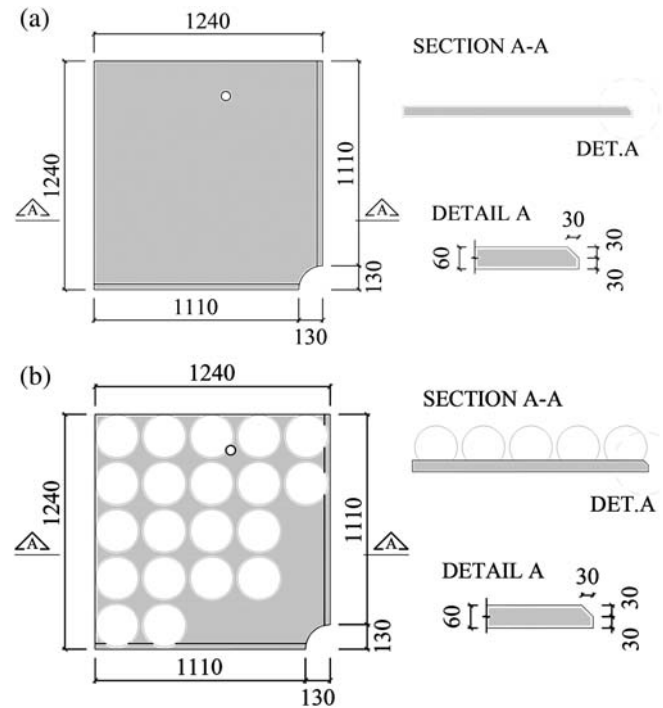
Geometry of the precast layer used in slab: (a) SSP, (b) BDP (dimensions in mm). BDP, *BubbleDeck* slab with precast floor plates; SSP, solid slab with precast floor plates
